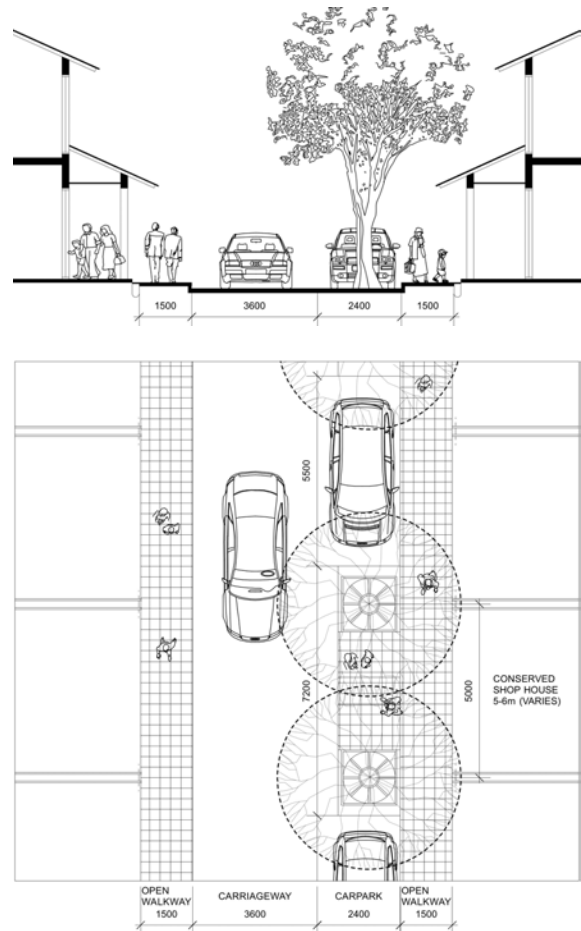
(a) Section and (b) Plan of a typical 9 m width road (Adapted from Melaka Town and Country Planning Department, 2008c and URA Singapore, 1997)
